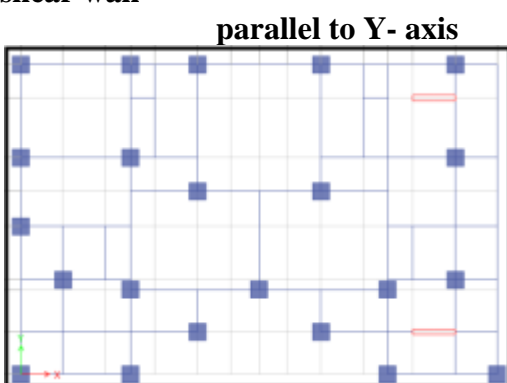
Plan showing structure with two shear wall parallel to X-axis
